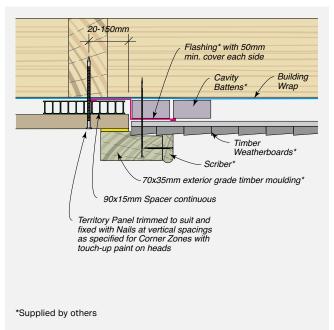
Typical Internal Corner Junction Panel to Weatherboard - Plan View
